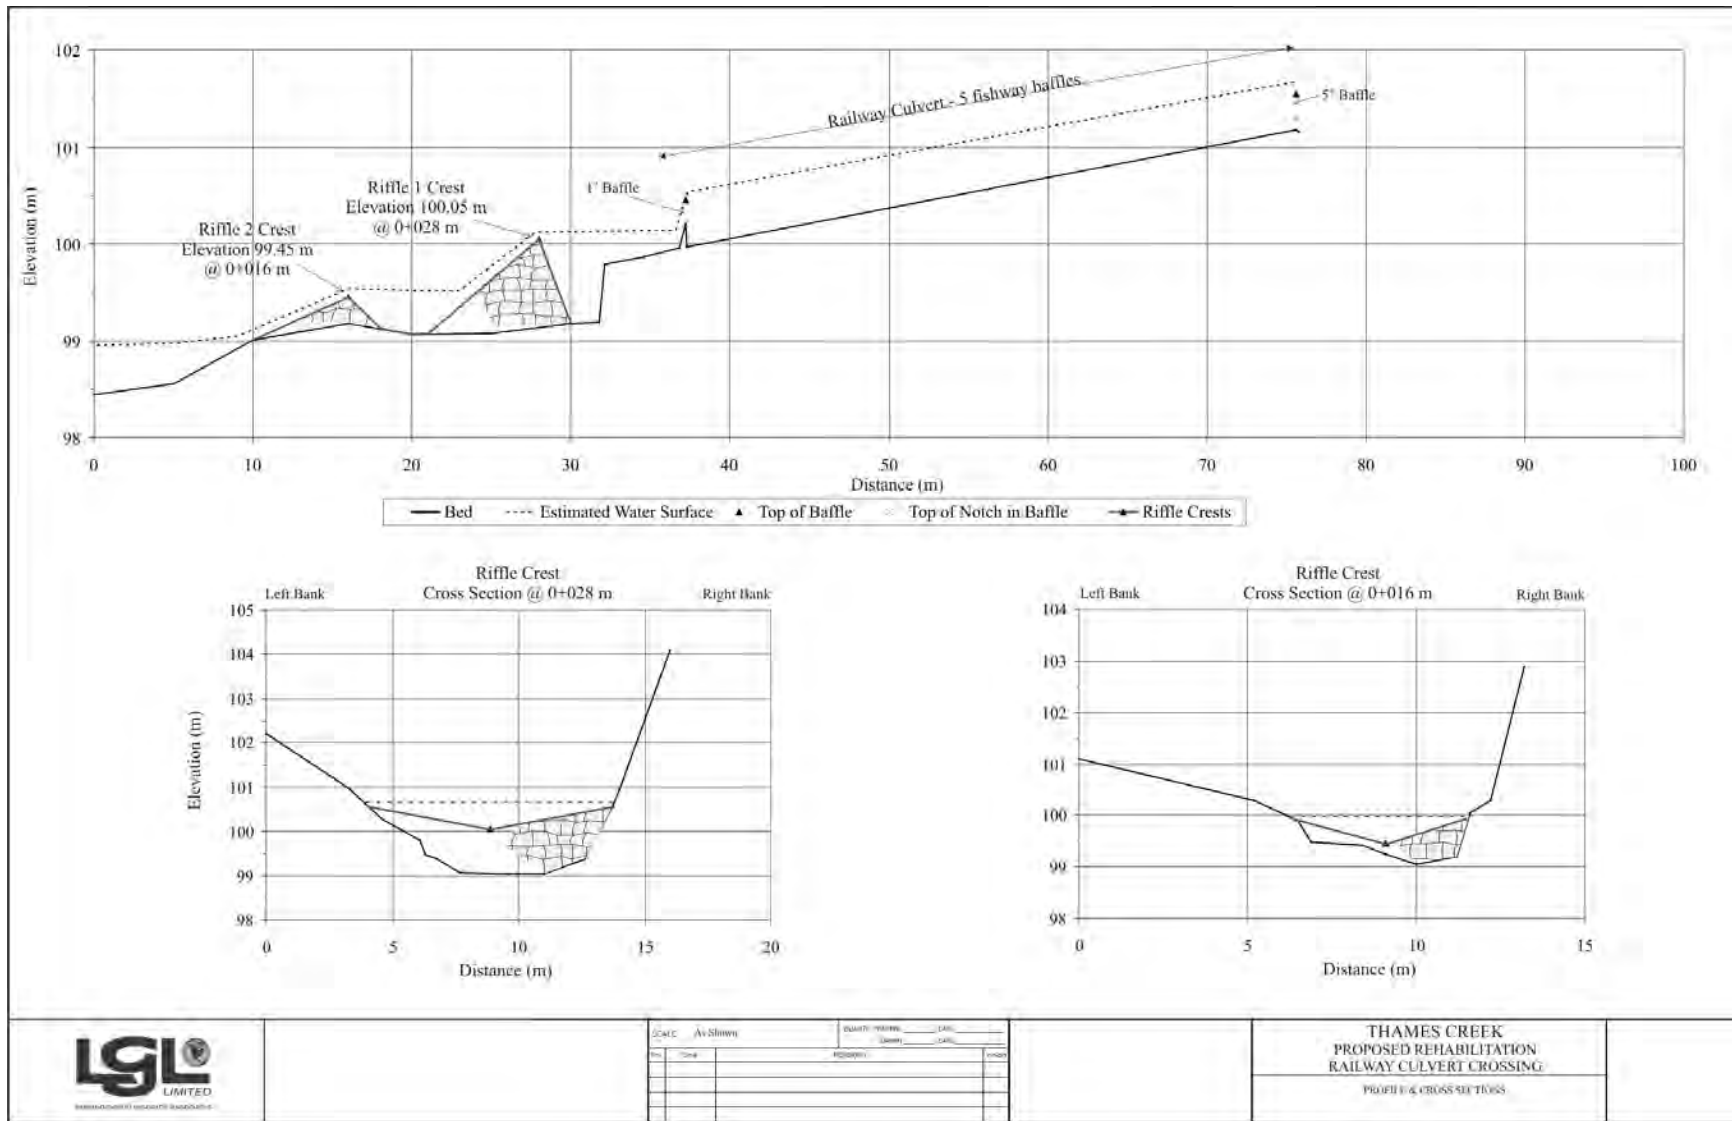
Proposed rehabilitation profile and cross sections for Thames Creek at Southern Railway culvert crossing.
